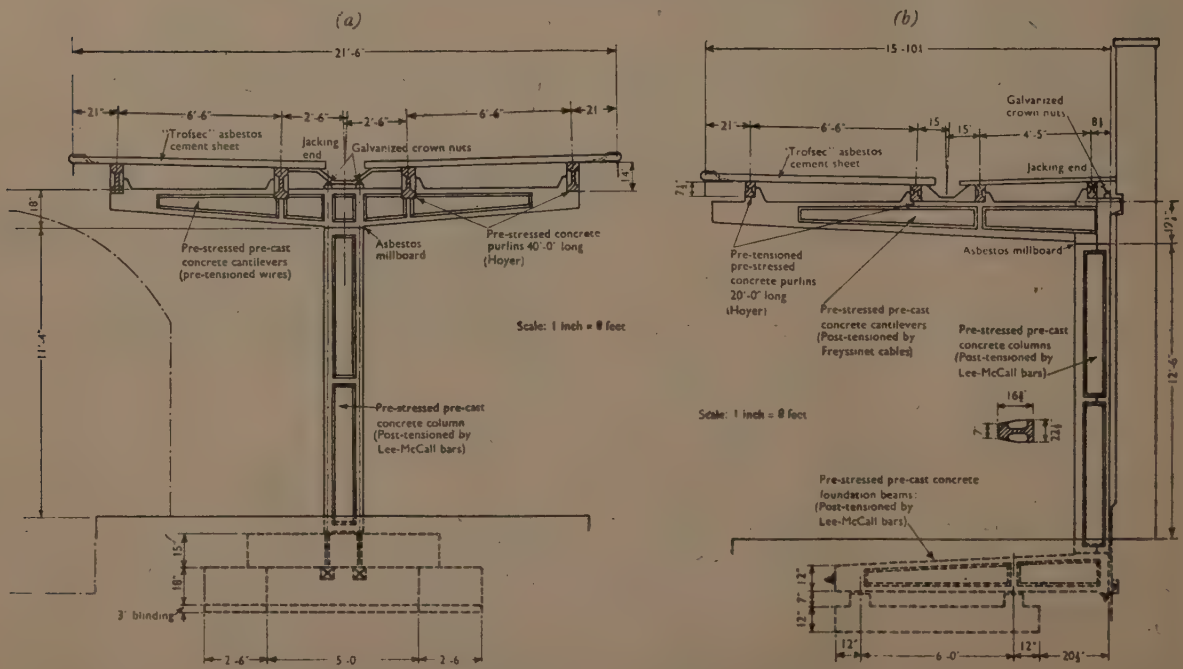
Cross-section of reconstruction of Yarmouth South Town Station
